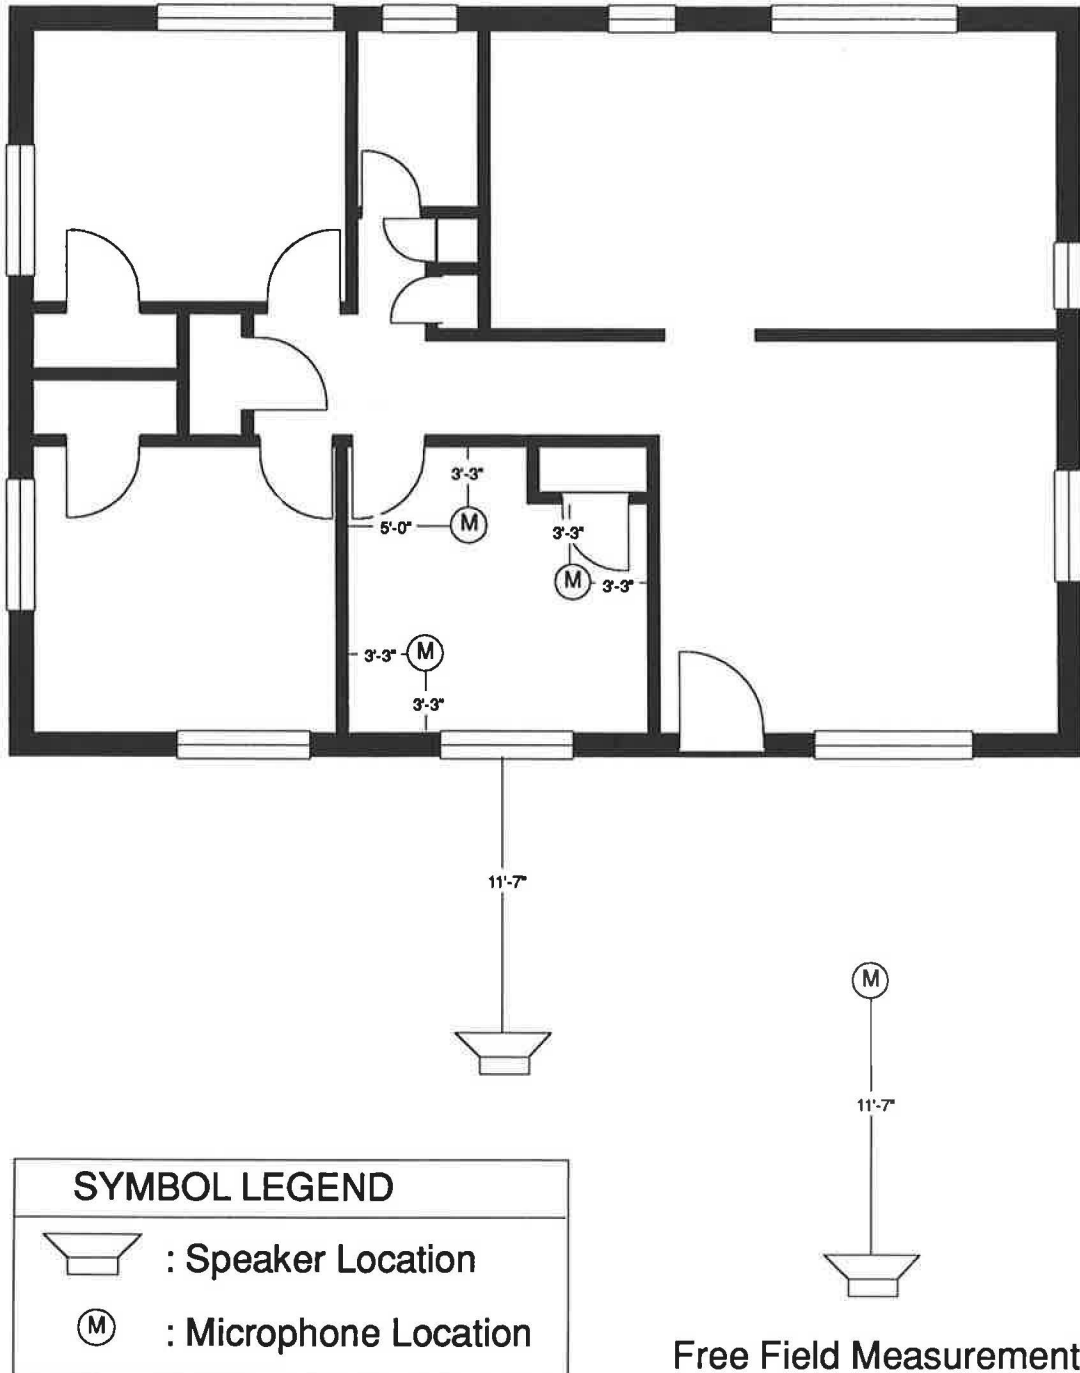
Floor plan of the Aurora sample home indicating acoustical test locations.
